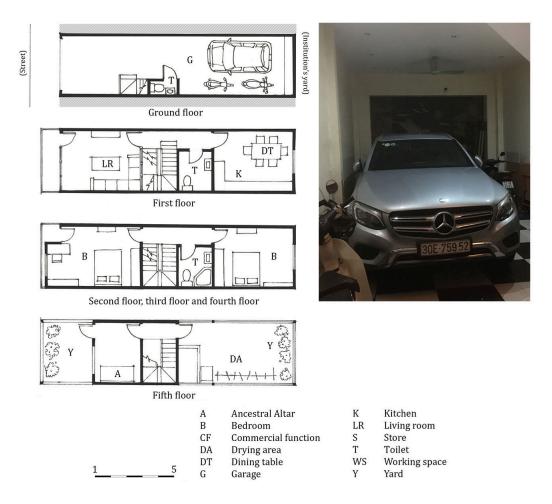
House in street or large alley might use ground floor as garage, living room and kitchen are located in the first floor.
